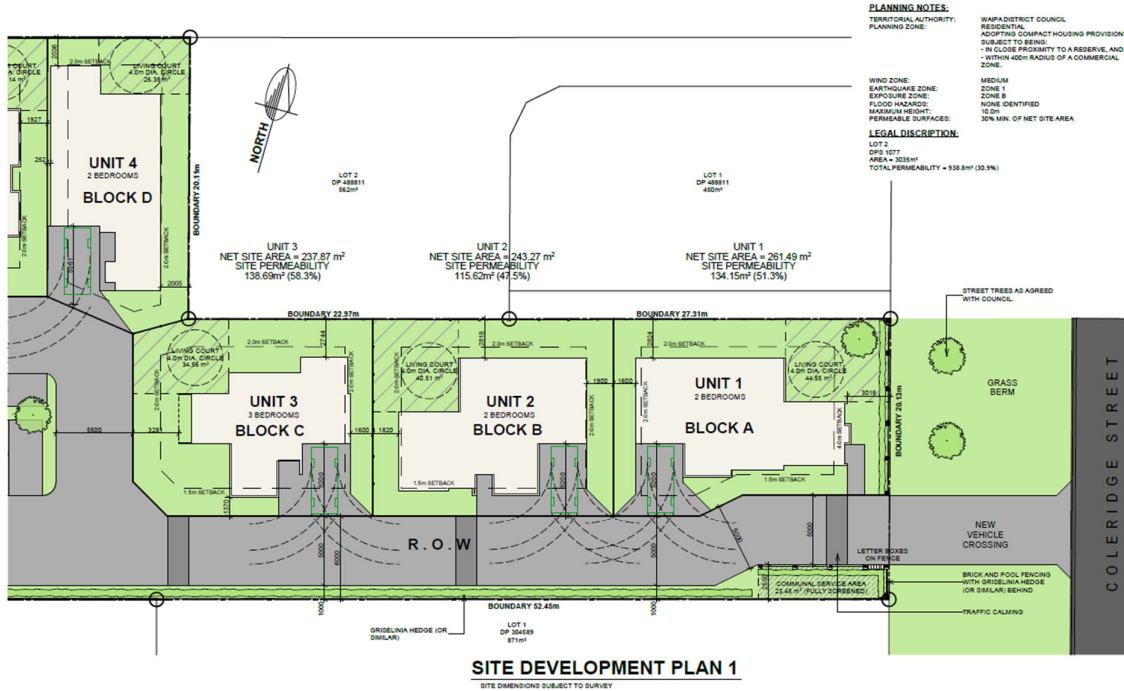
PROPOSED SITE DEVELOPMENT PLAN (EASTERN PORTION) – 9 APRIL 2021
